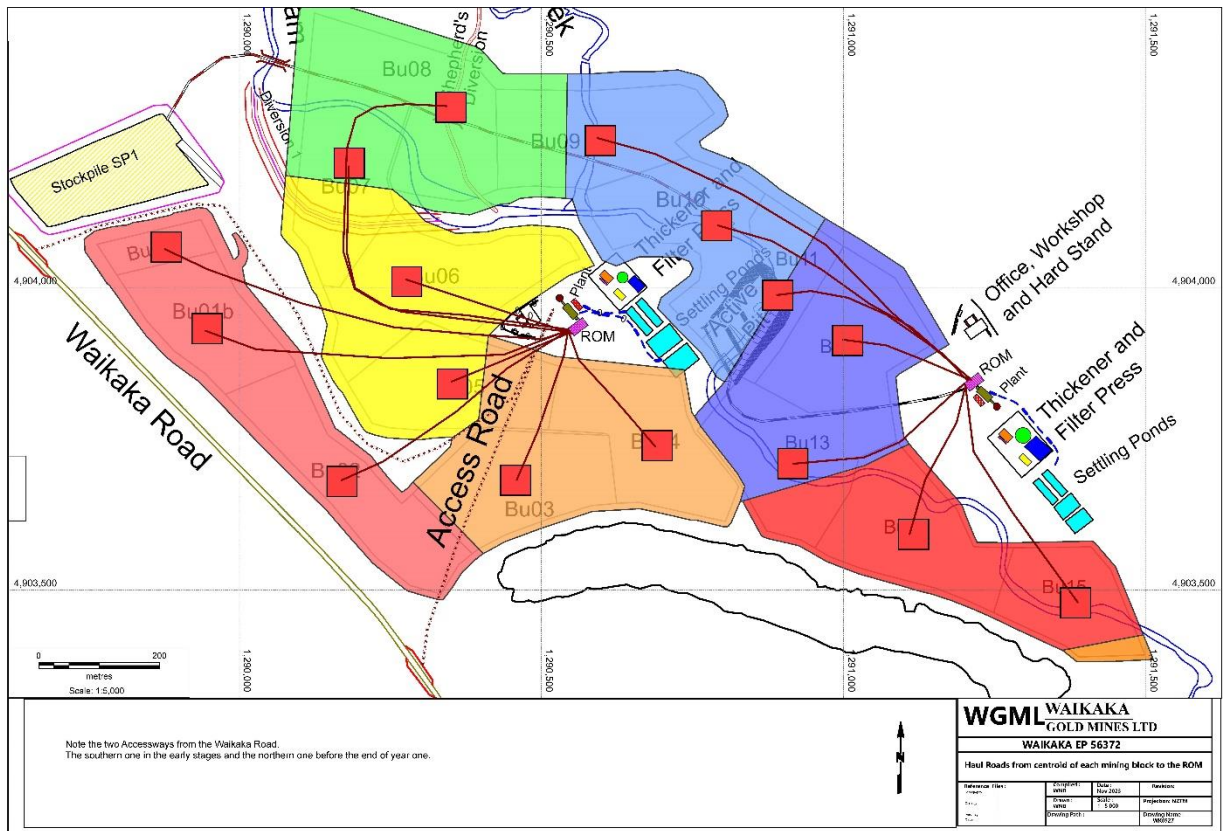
Haul Road Layout with resource Block centroids to the ROM areas
